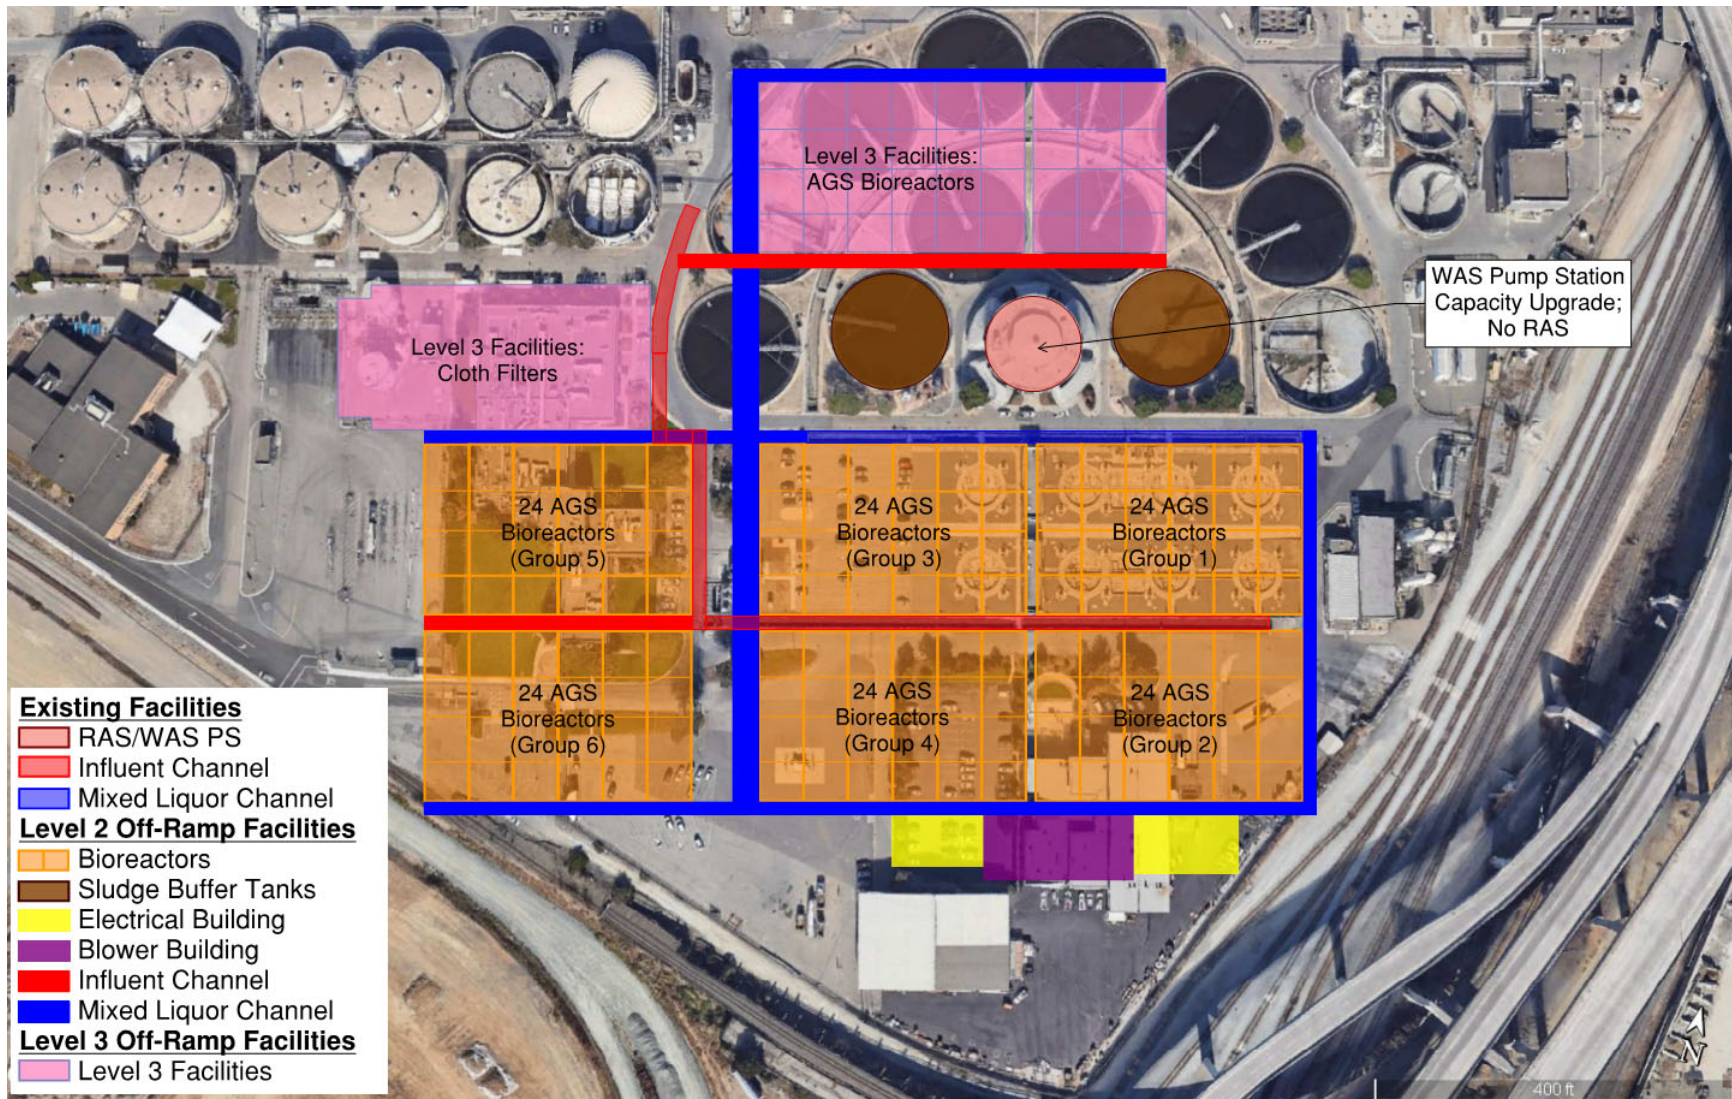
Alternative 5 AGS – Conceptual Site Layout
